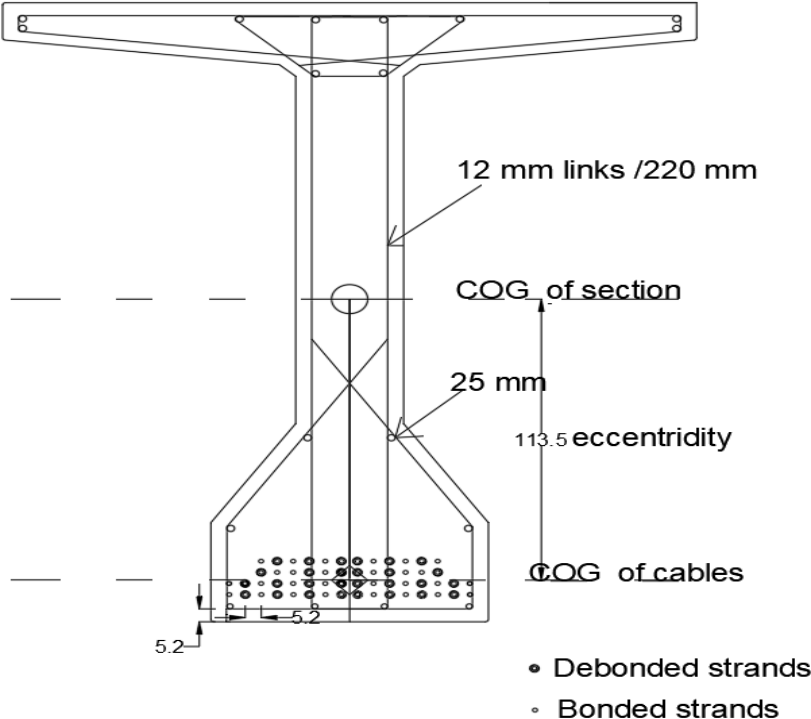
Detailed section of precast beam at supports for the BAEL Design.
